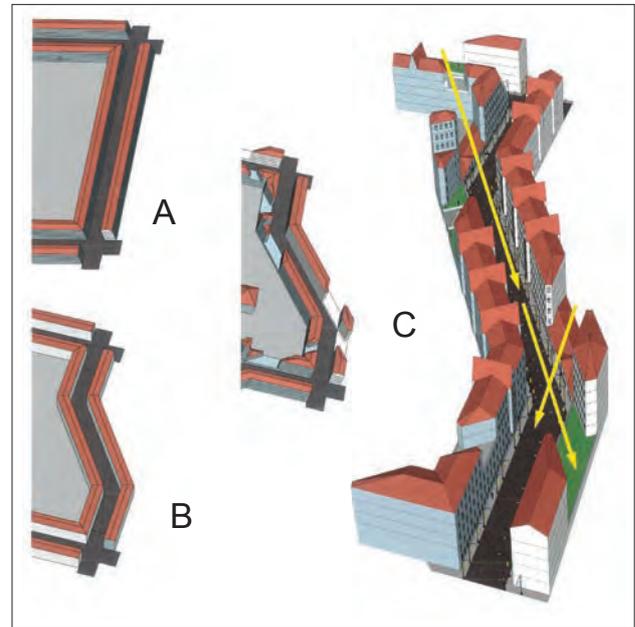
A grid street cranked in plan with the sections of surrounding buildings modified to improve daylight penetration. (Sundborg, 2016)
